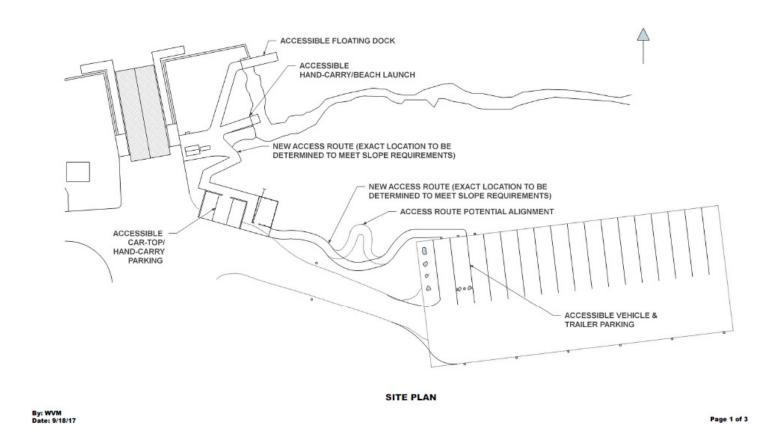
Site plan details for the construction of the accessible beach launch and accessible parking at the Cranberry Lake BLS.
